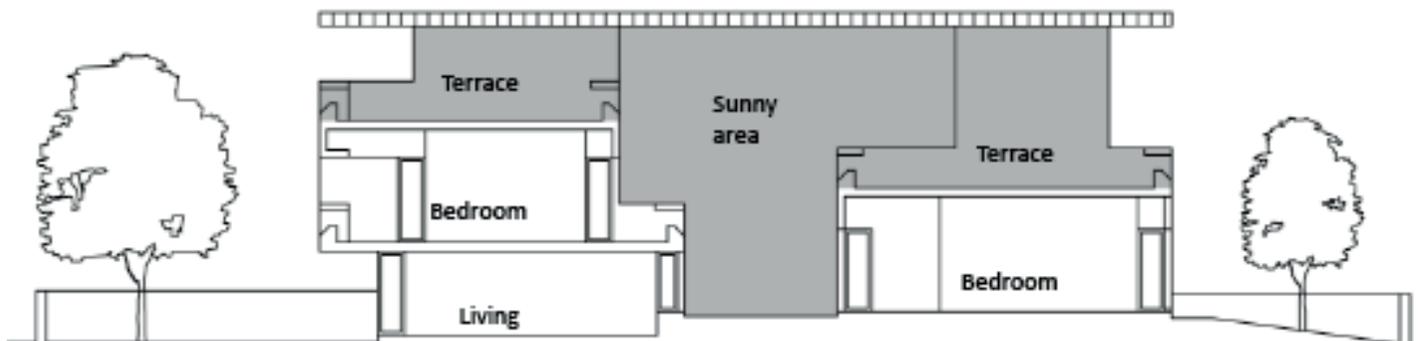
PAREKH HOUSE DRAWINGS, EXTERIOR AND INTERIOR
